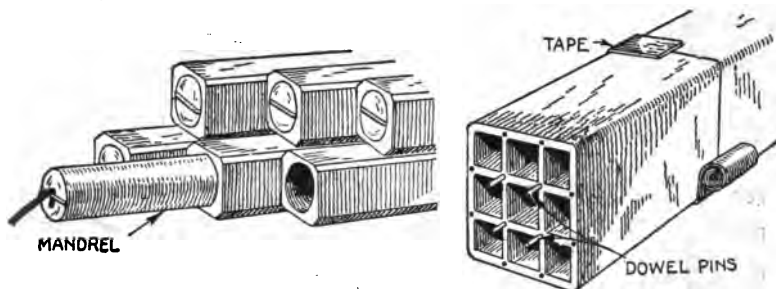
,347.—Method of laying single duct vitrified clay conduit. The tiles of the several ducts are placed close together as shown in the figure, and the joints plastered and filled with cement mortar consisting of one part Portland cement and one part sand.
